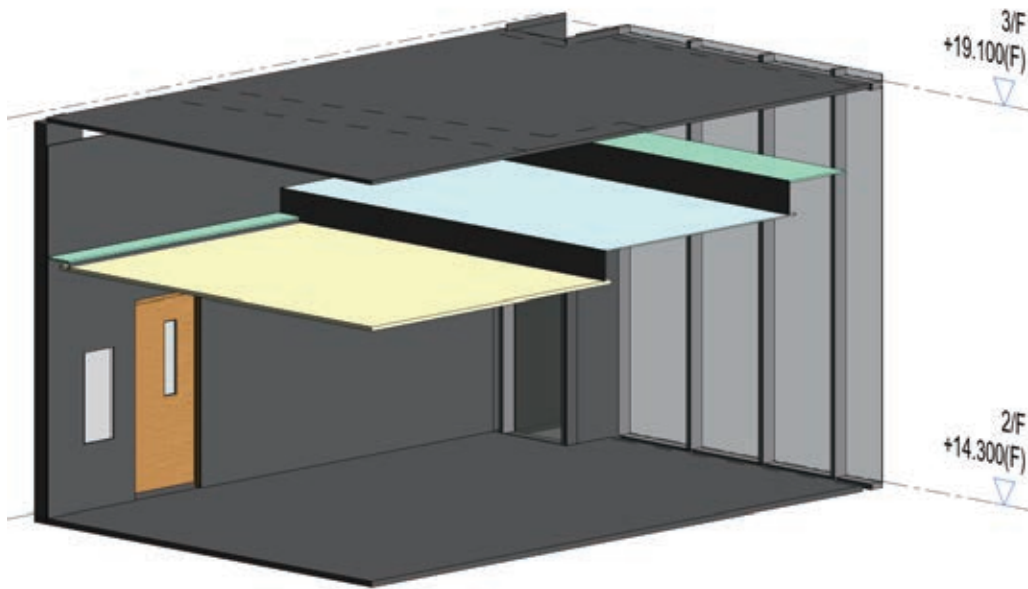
3D View of Bulkheads to ceiling
